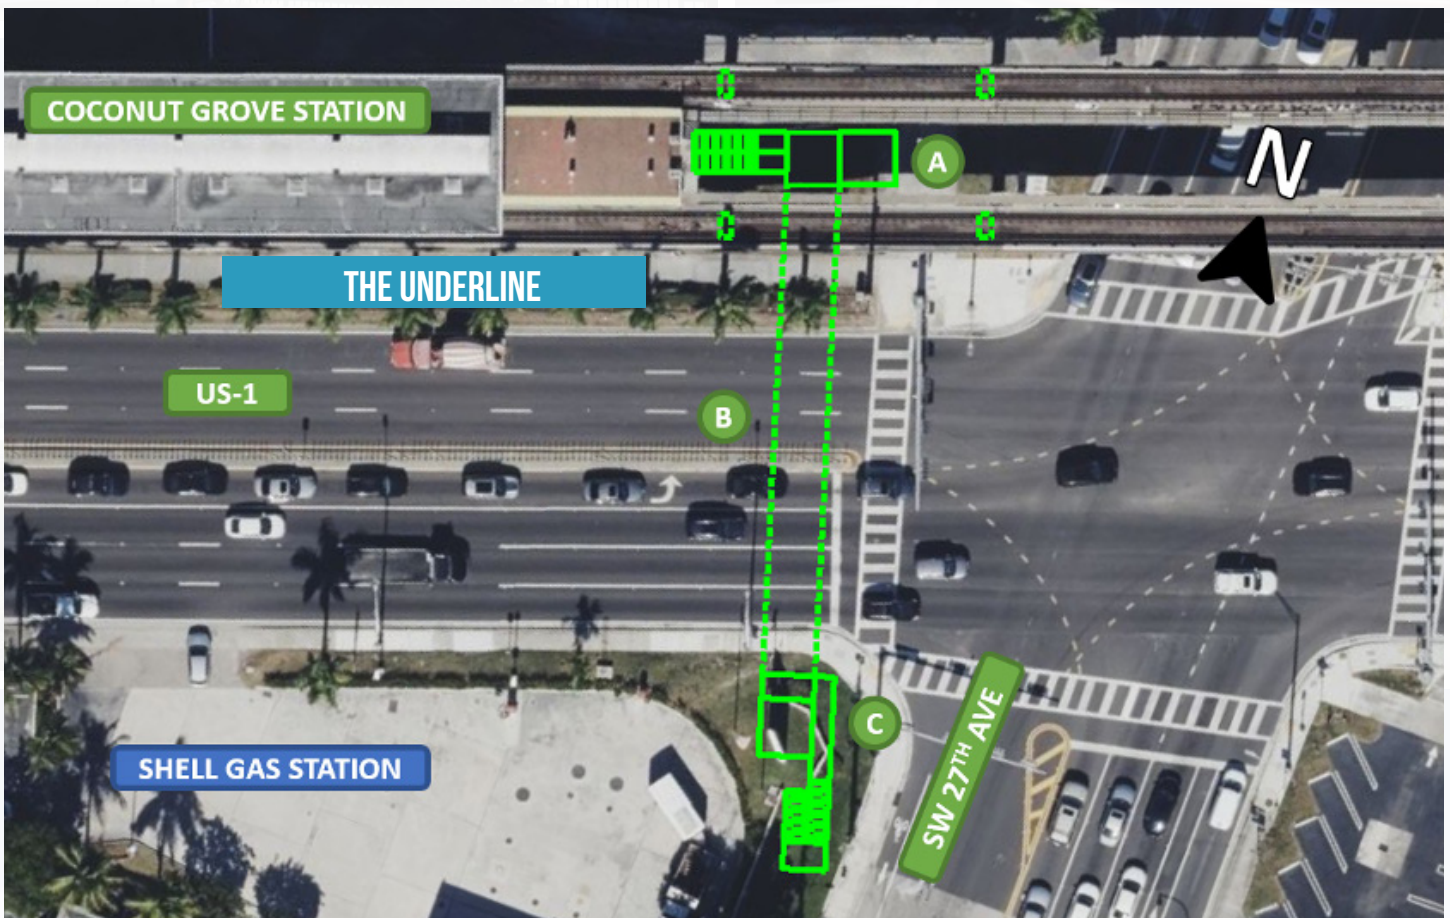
Coconut Grove Metrorail Station Alternative 2 Bridge Location
